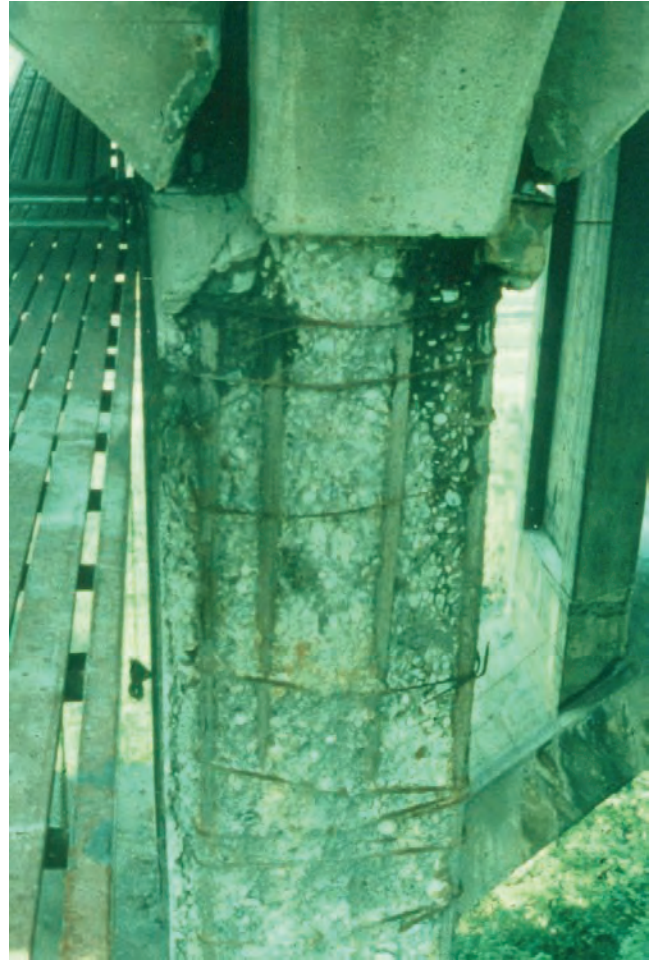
Severe Scaling and Spalling on a Spandrel Column
